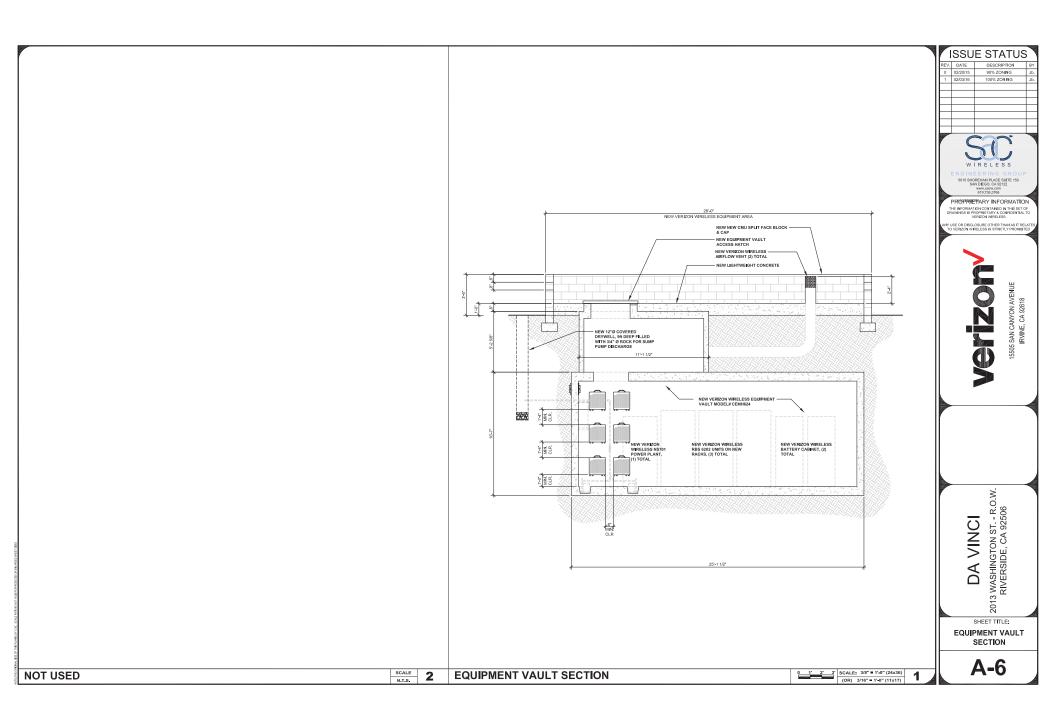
P15-0896 & P15-1040, Project Plans
